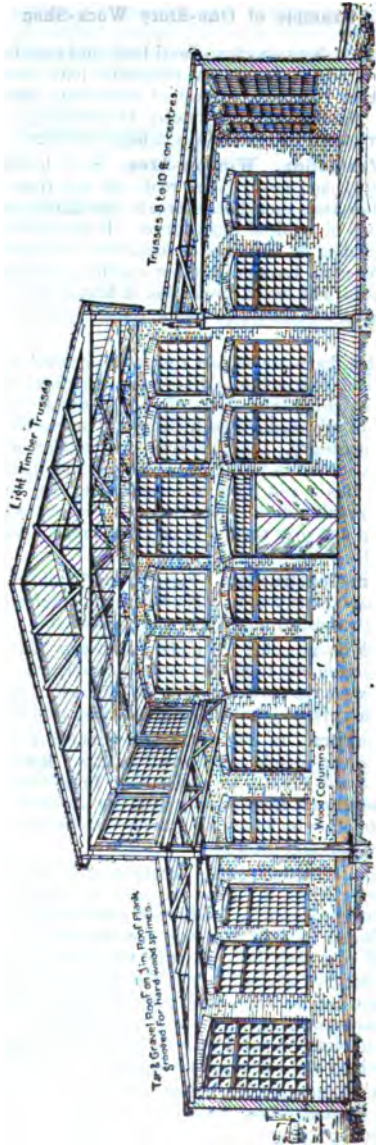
One-story Work-shop. Roof-boards on Trusses
